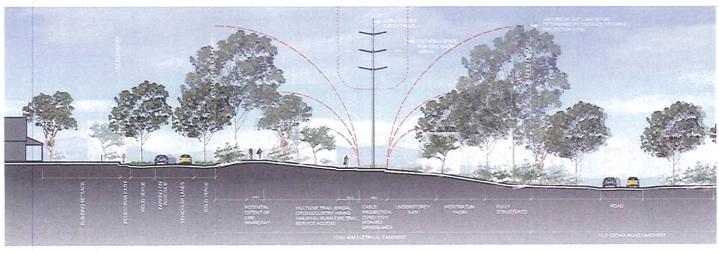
Typical Old Cooma Road Easement Section - Looking South
